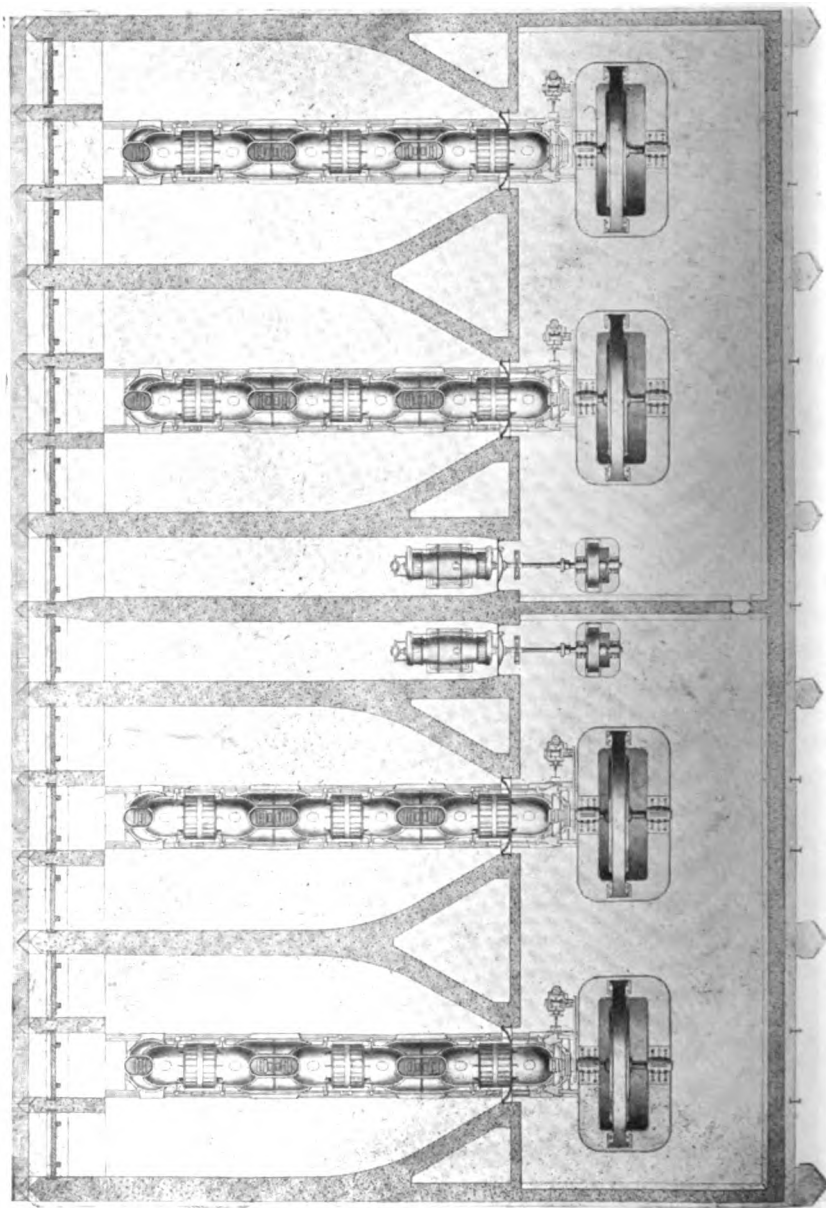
Power House of Southern Wisconsin Power Co., Kilbourn. Horizontal Turbines Connected Tandem in Open Penstock.
